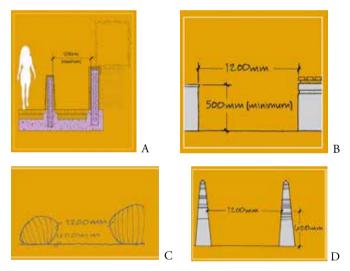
Maximum recommended distances between barriers: cylindrical posts (A), concrete block street furniture (B); irregularly shaped street furniture (C), 600-1200 mm spaced obstacles, cone-shaped posts (D).
